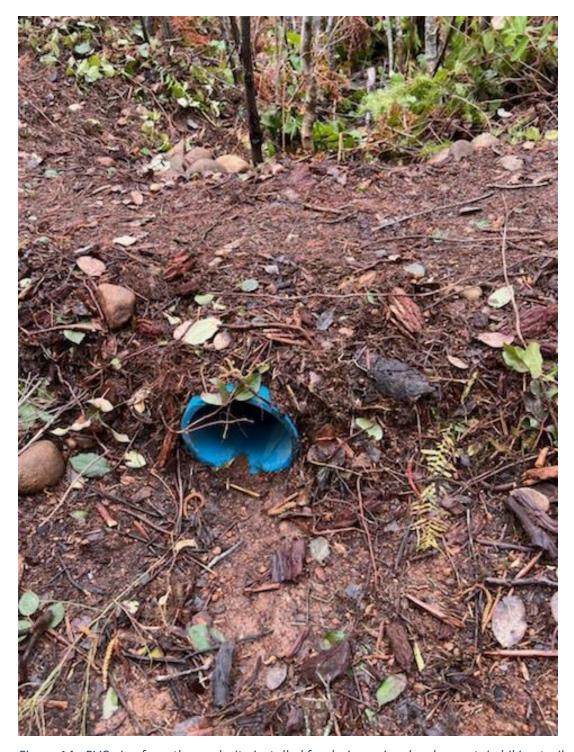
PVC pipe from the work site installed for drainage in a local mountain biking trail.
